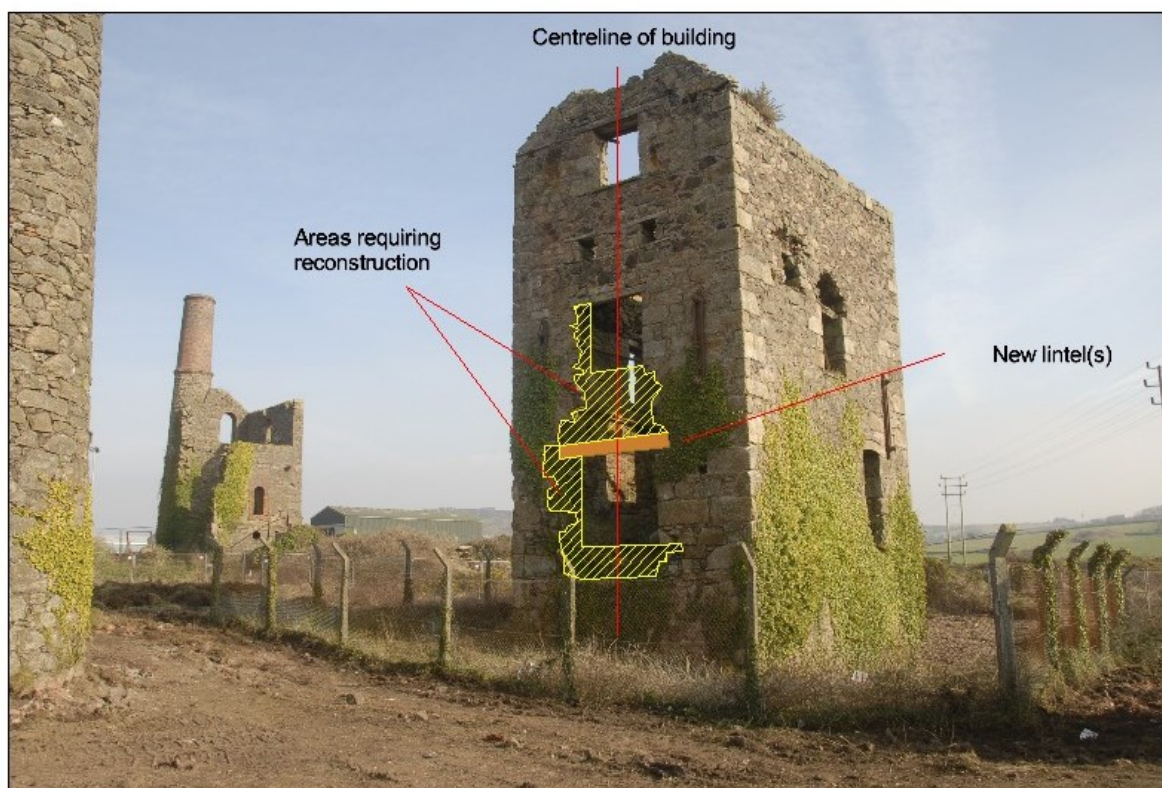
The HE Projects recommended reconstruction of the openings in the southern elevation of the pumping engine house. This approach was unfortunately rejected on cost grounds.
